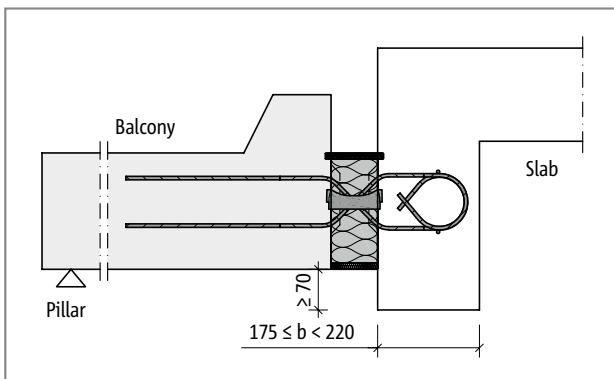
Schöck Isokorb® T type Q-E-W-VV: Installation situation "pre-cast balcony slab" (e.g. T type Q-E-W-VV1 to VV3)
